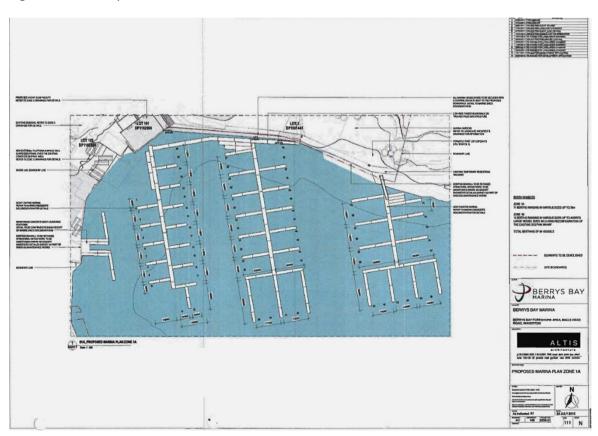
The proposed marina plan permitted by MSB that was rejected by the planning panel in 2016
